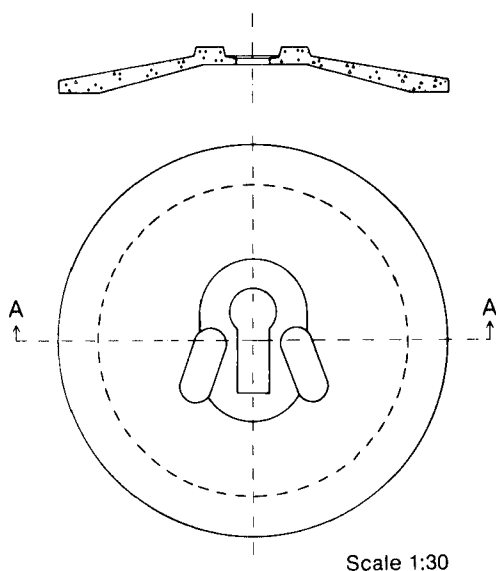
Plan and cross-sectional views of slab of nonreinforced concrete used for conventional pit latrines. The ratio of cement : river sand : 1/4 in. stone used to make the cement mixture is 1:2:1.5. When tested, the slab supported the weight of 9 people but failed with 10. Every slab is tested and must support the weight of six people before it can be put over a pit and used.
